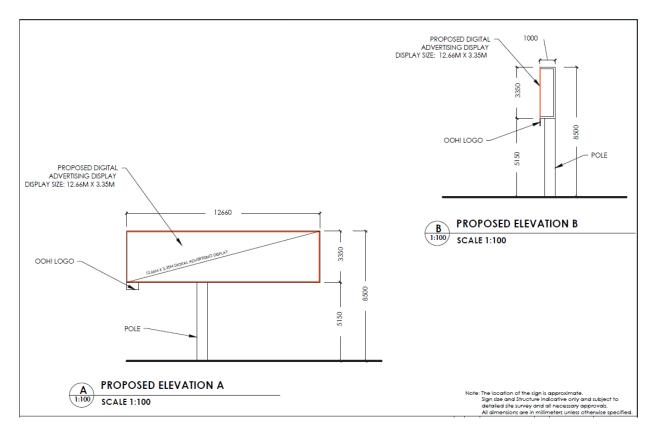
Proposed elevations of the billboard and advertising signage structure (Source: oOh!media)
